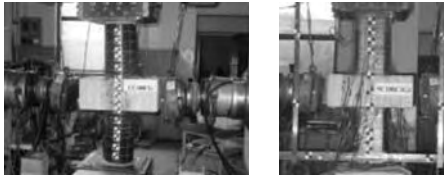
Test set-up for RC columns under high axial load and cyclic lateral load.
